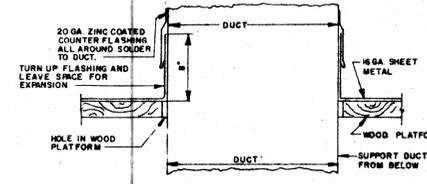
DETAILS OF THE INSTALLATION OF THE ROOF MOUNTED UTILITY VENT SET.
